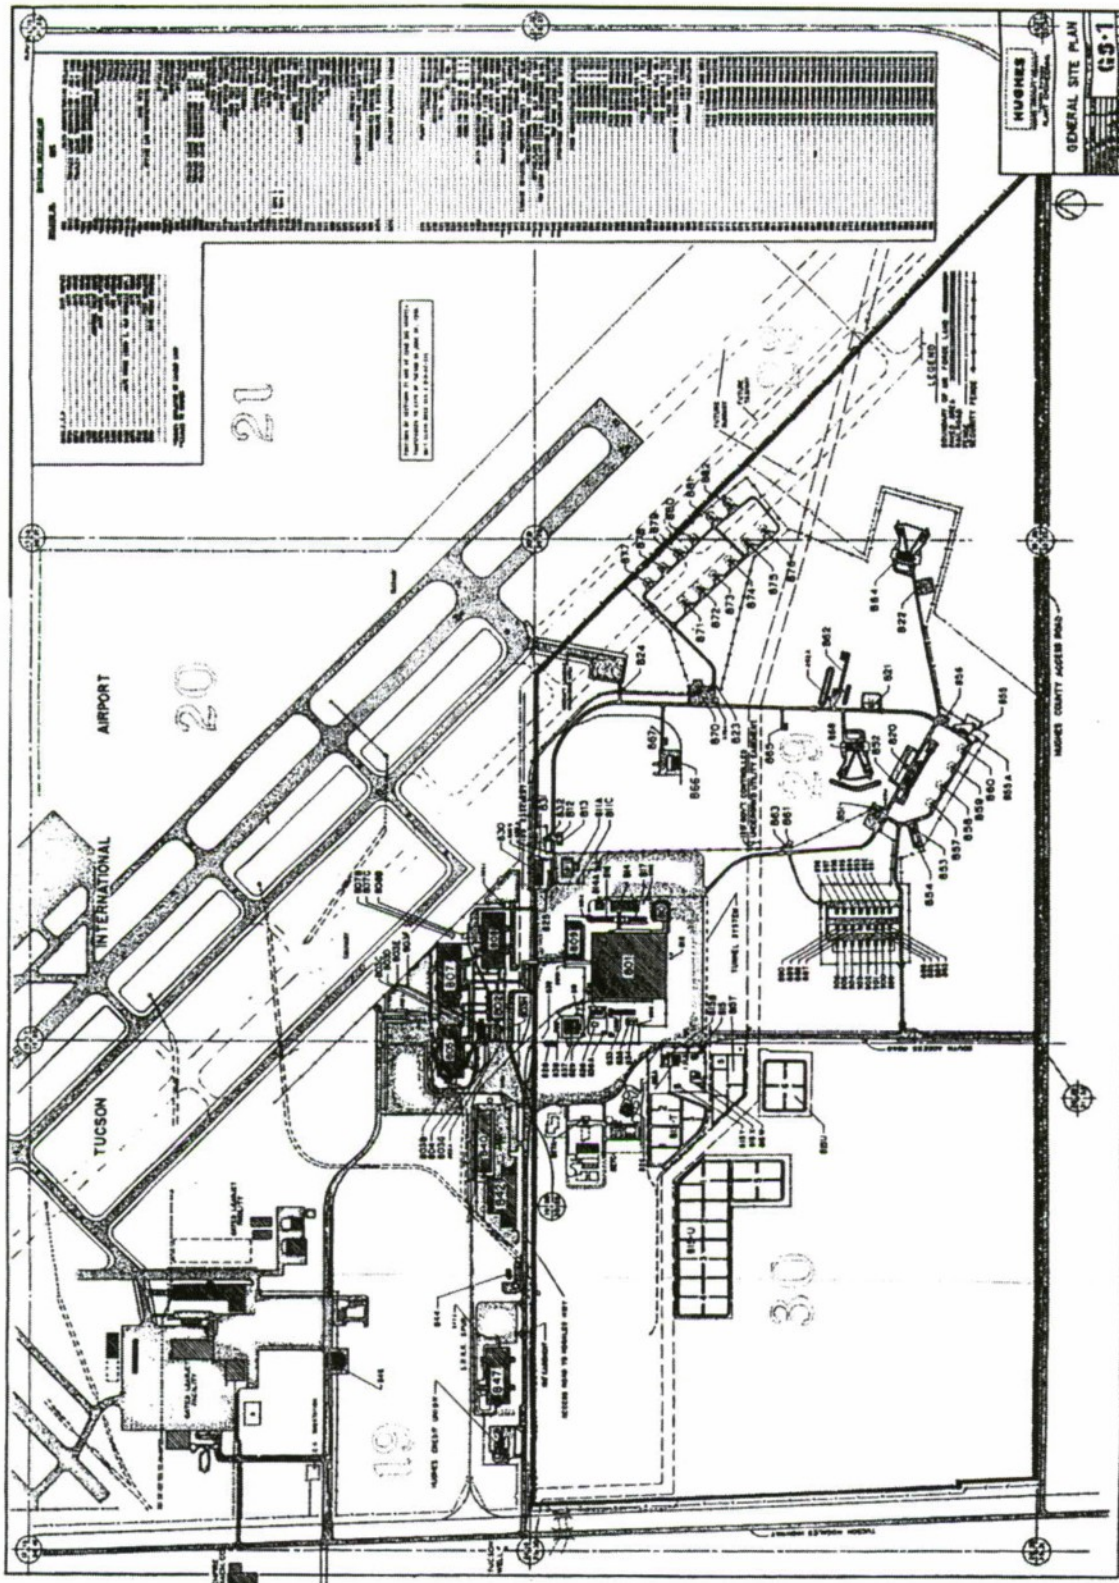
Hughes Aircraft Company. Air Force Plant 44, Tucson, Arizona. General Site Plan. In *Historic Building Inventory and Evaluation of Air Force Plant 44*, 1996.
